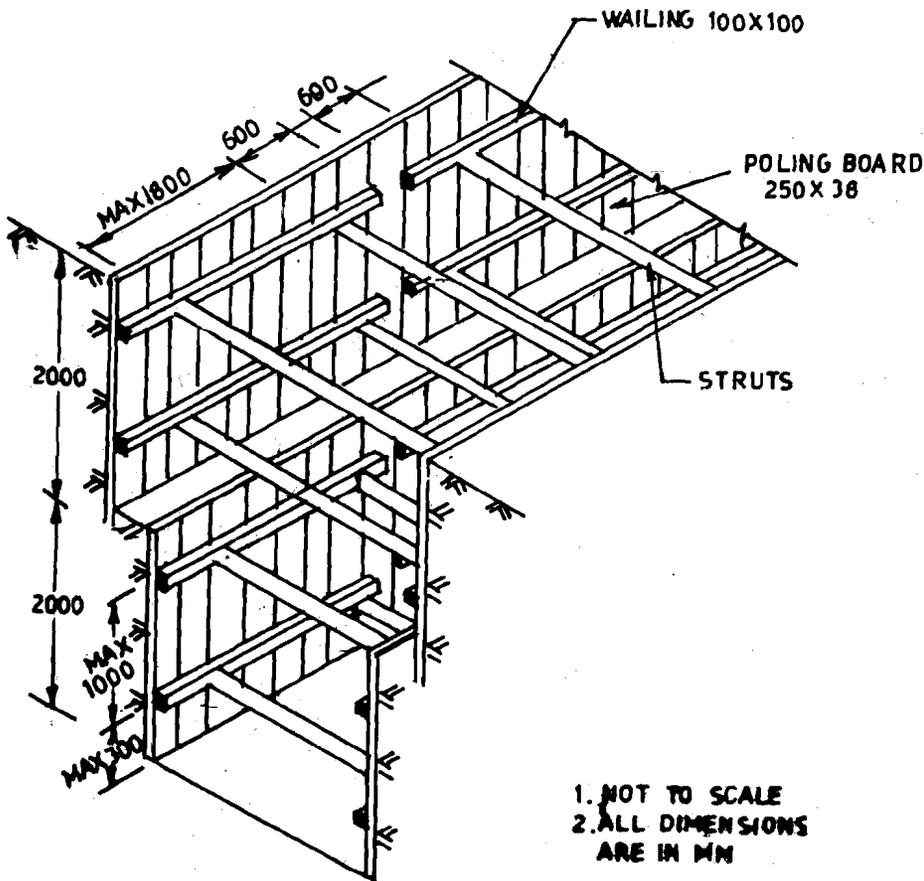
Close Planking & Strutting with Vertical Poling Board
